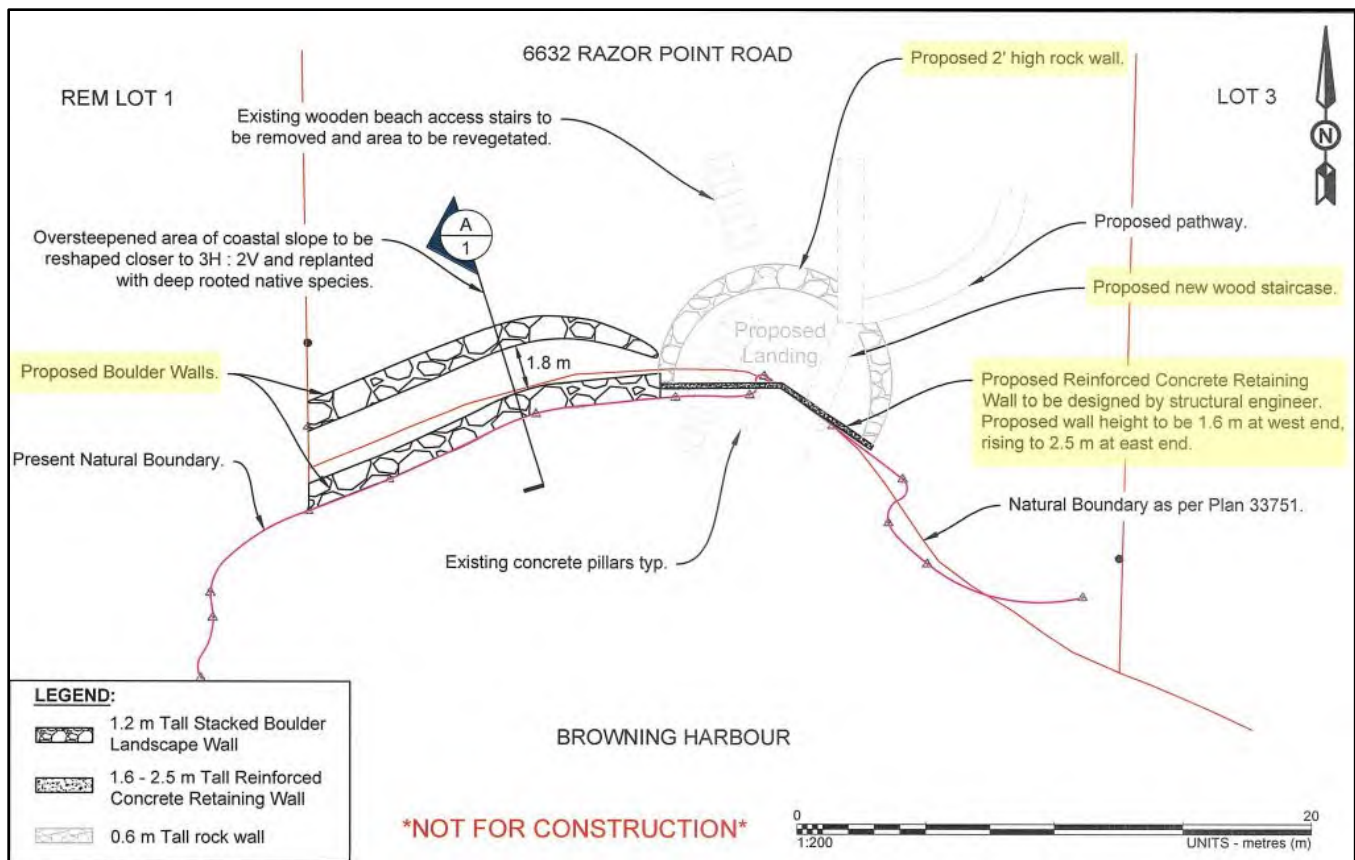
Site Plan, Highlighted Sections Requiring Variance
